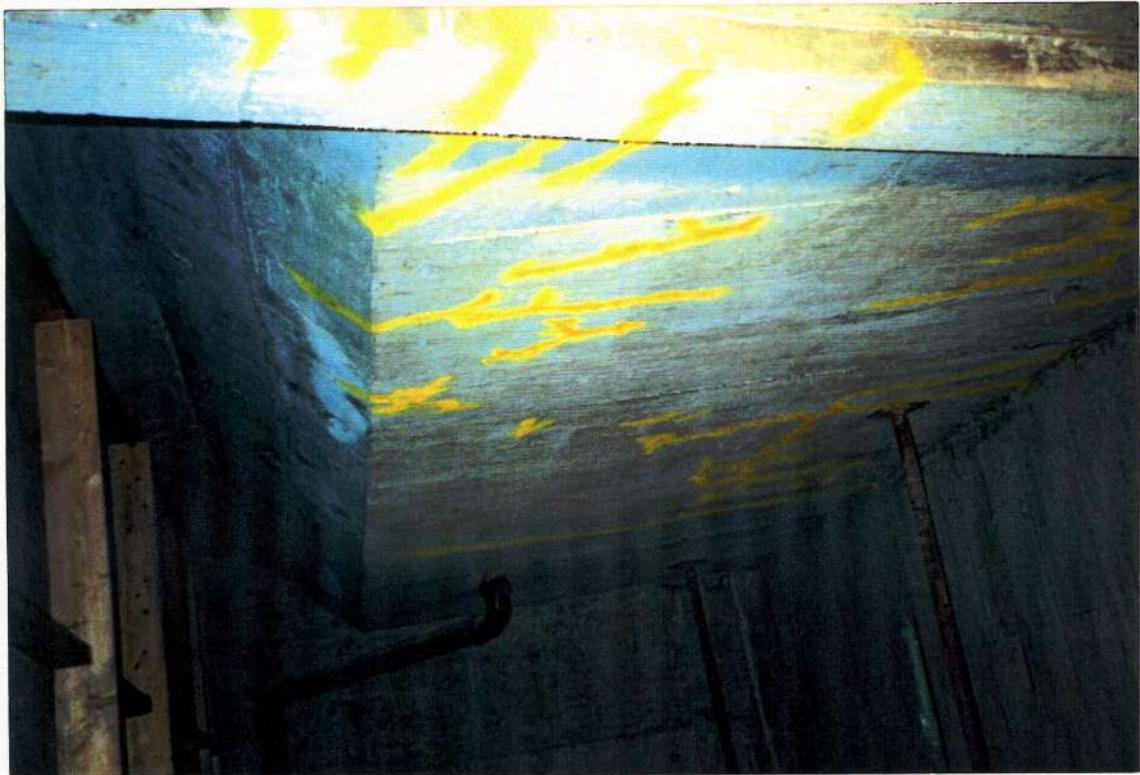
Planter A, soffit at south east end (EC/TL1/11)
